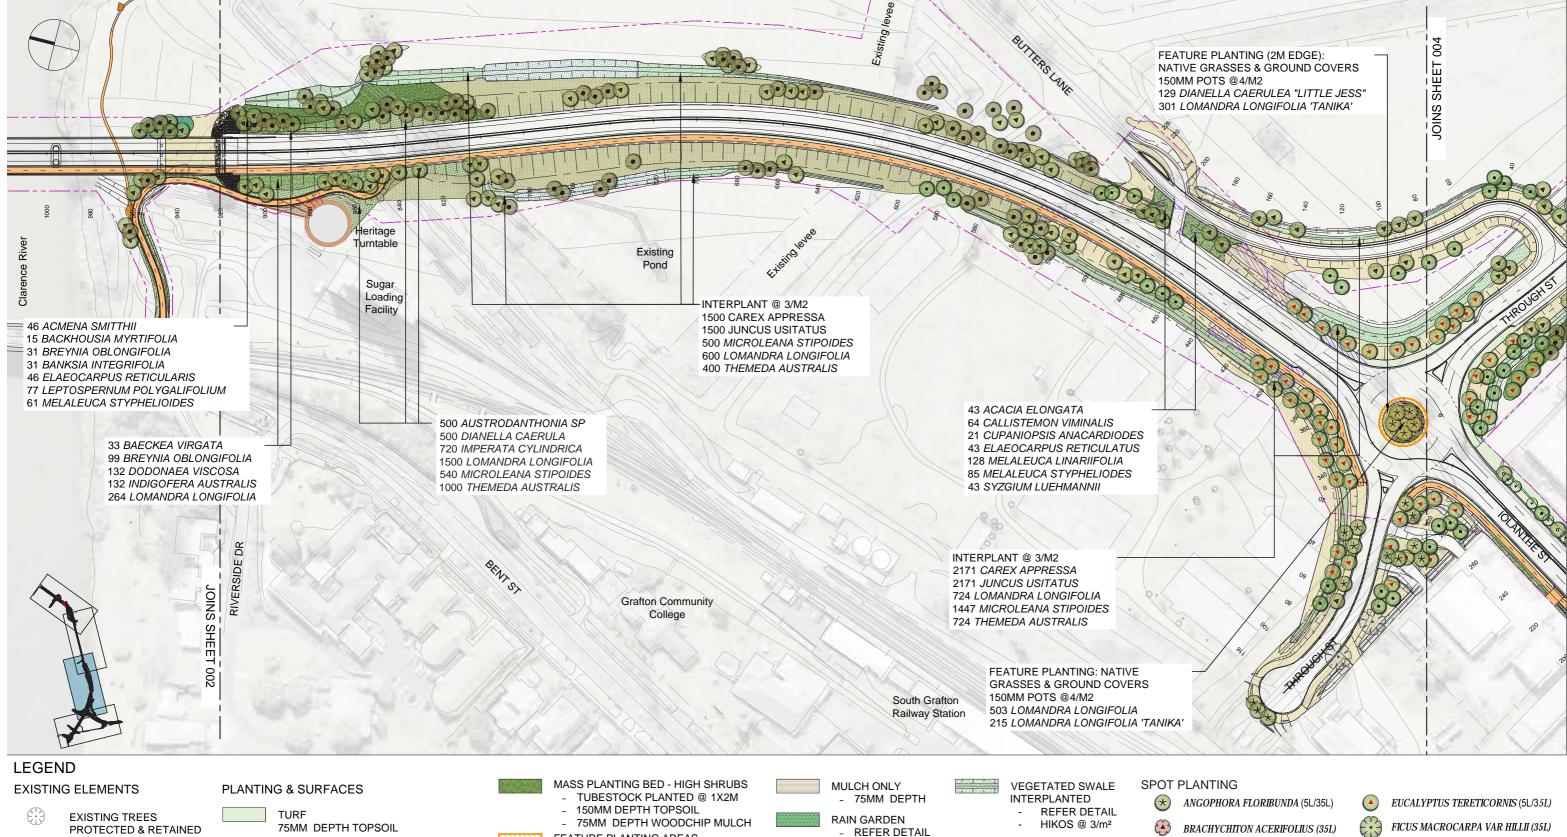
Planting Plans Conforming Detail - Pound and Clarence Streets (Scale 1:1000) - Sheet 3
